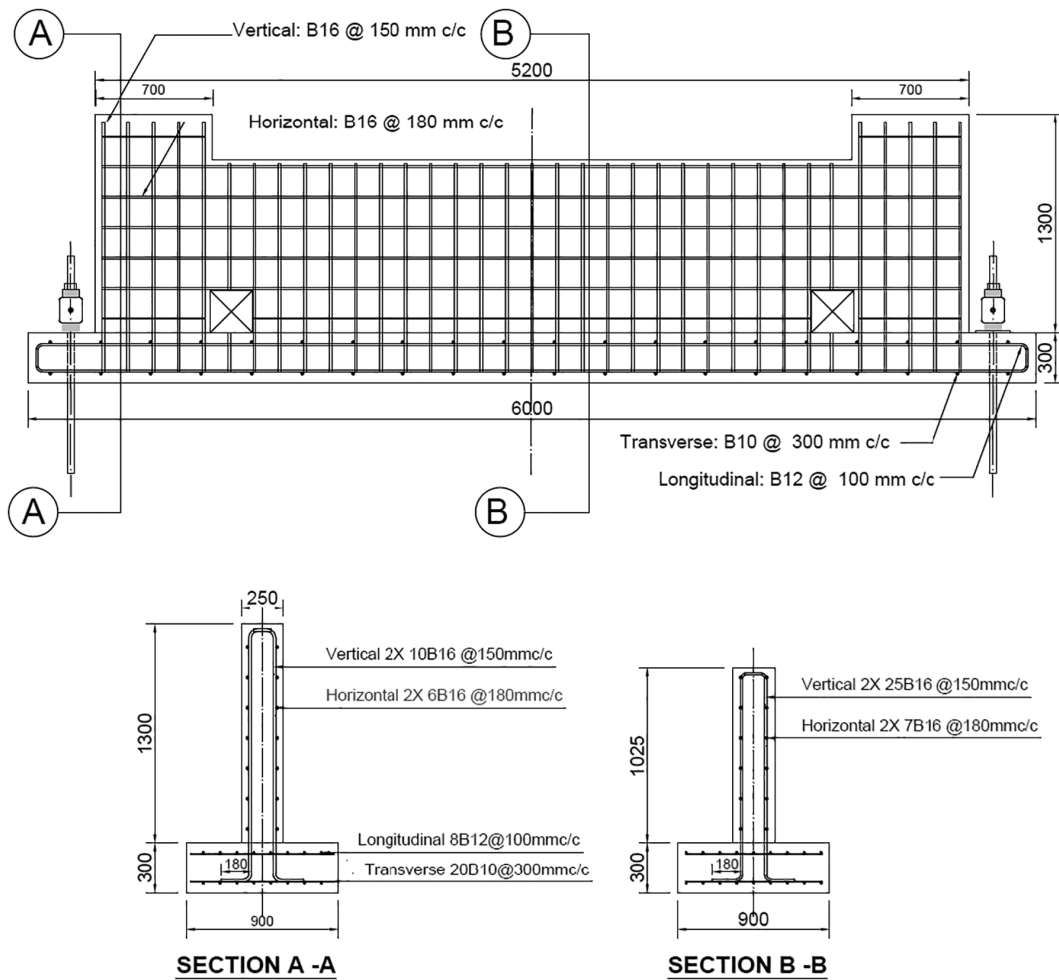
Geometry and reinforcement of wall ICL-2. ICL, Imperial College London
